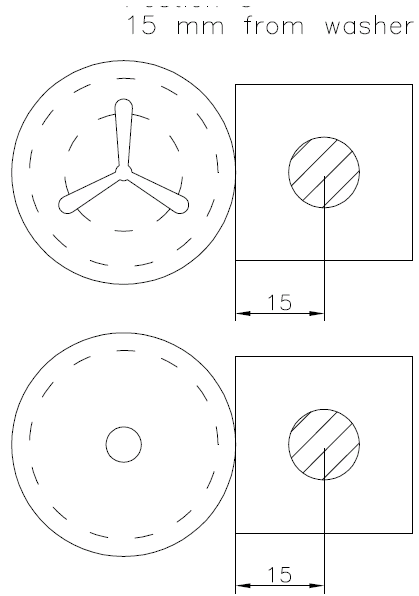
Position of thermocouples near washers with pin diameter exceeding 3.5 mm
